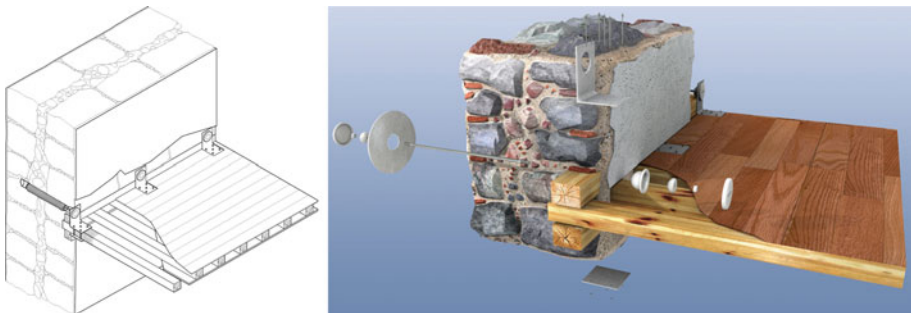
Views of the “wood storey structure—masonry wall” connection, proposed by STAP (Cóias e Silva 2007)
